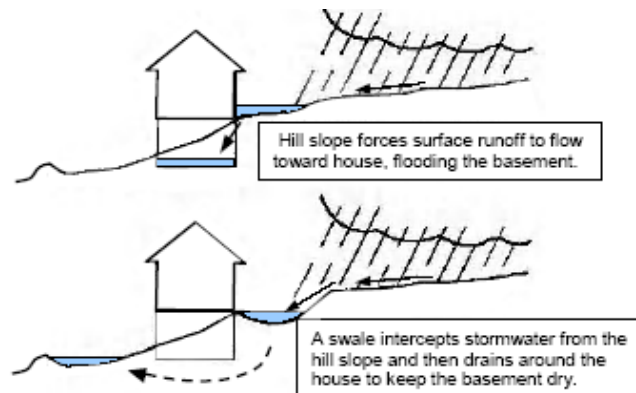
Correction of typical slope drainage problem using swale or ditch.
